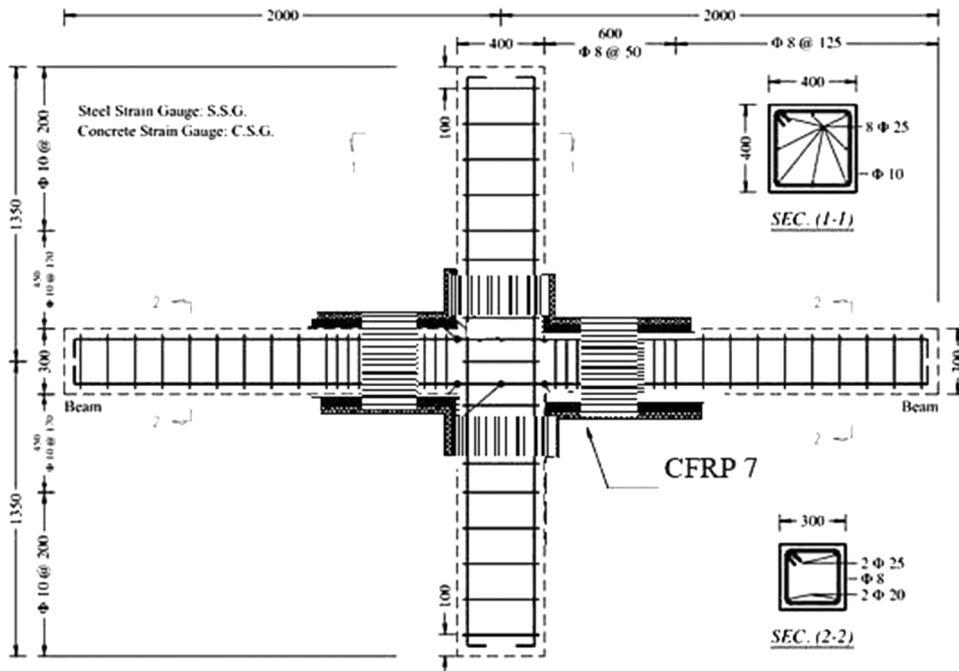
Strain gauges positions and steel bars details connection strengthened with CFRP, J-1.
